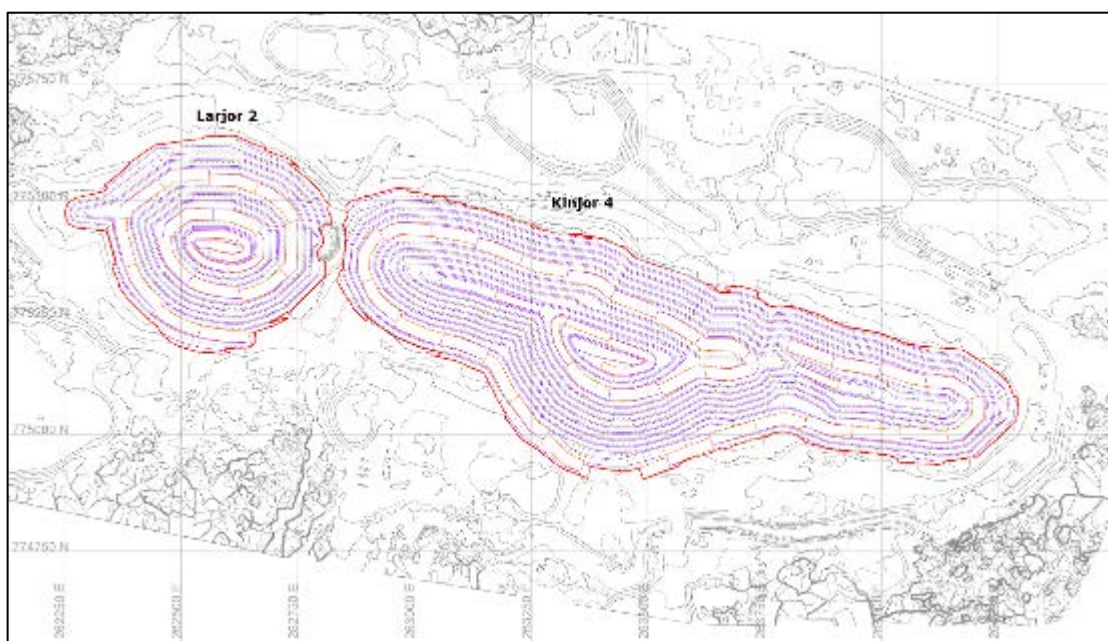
Pit Design – Stage 6 & 7: Kinjor 4 & Larjor 2
